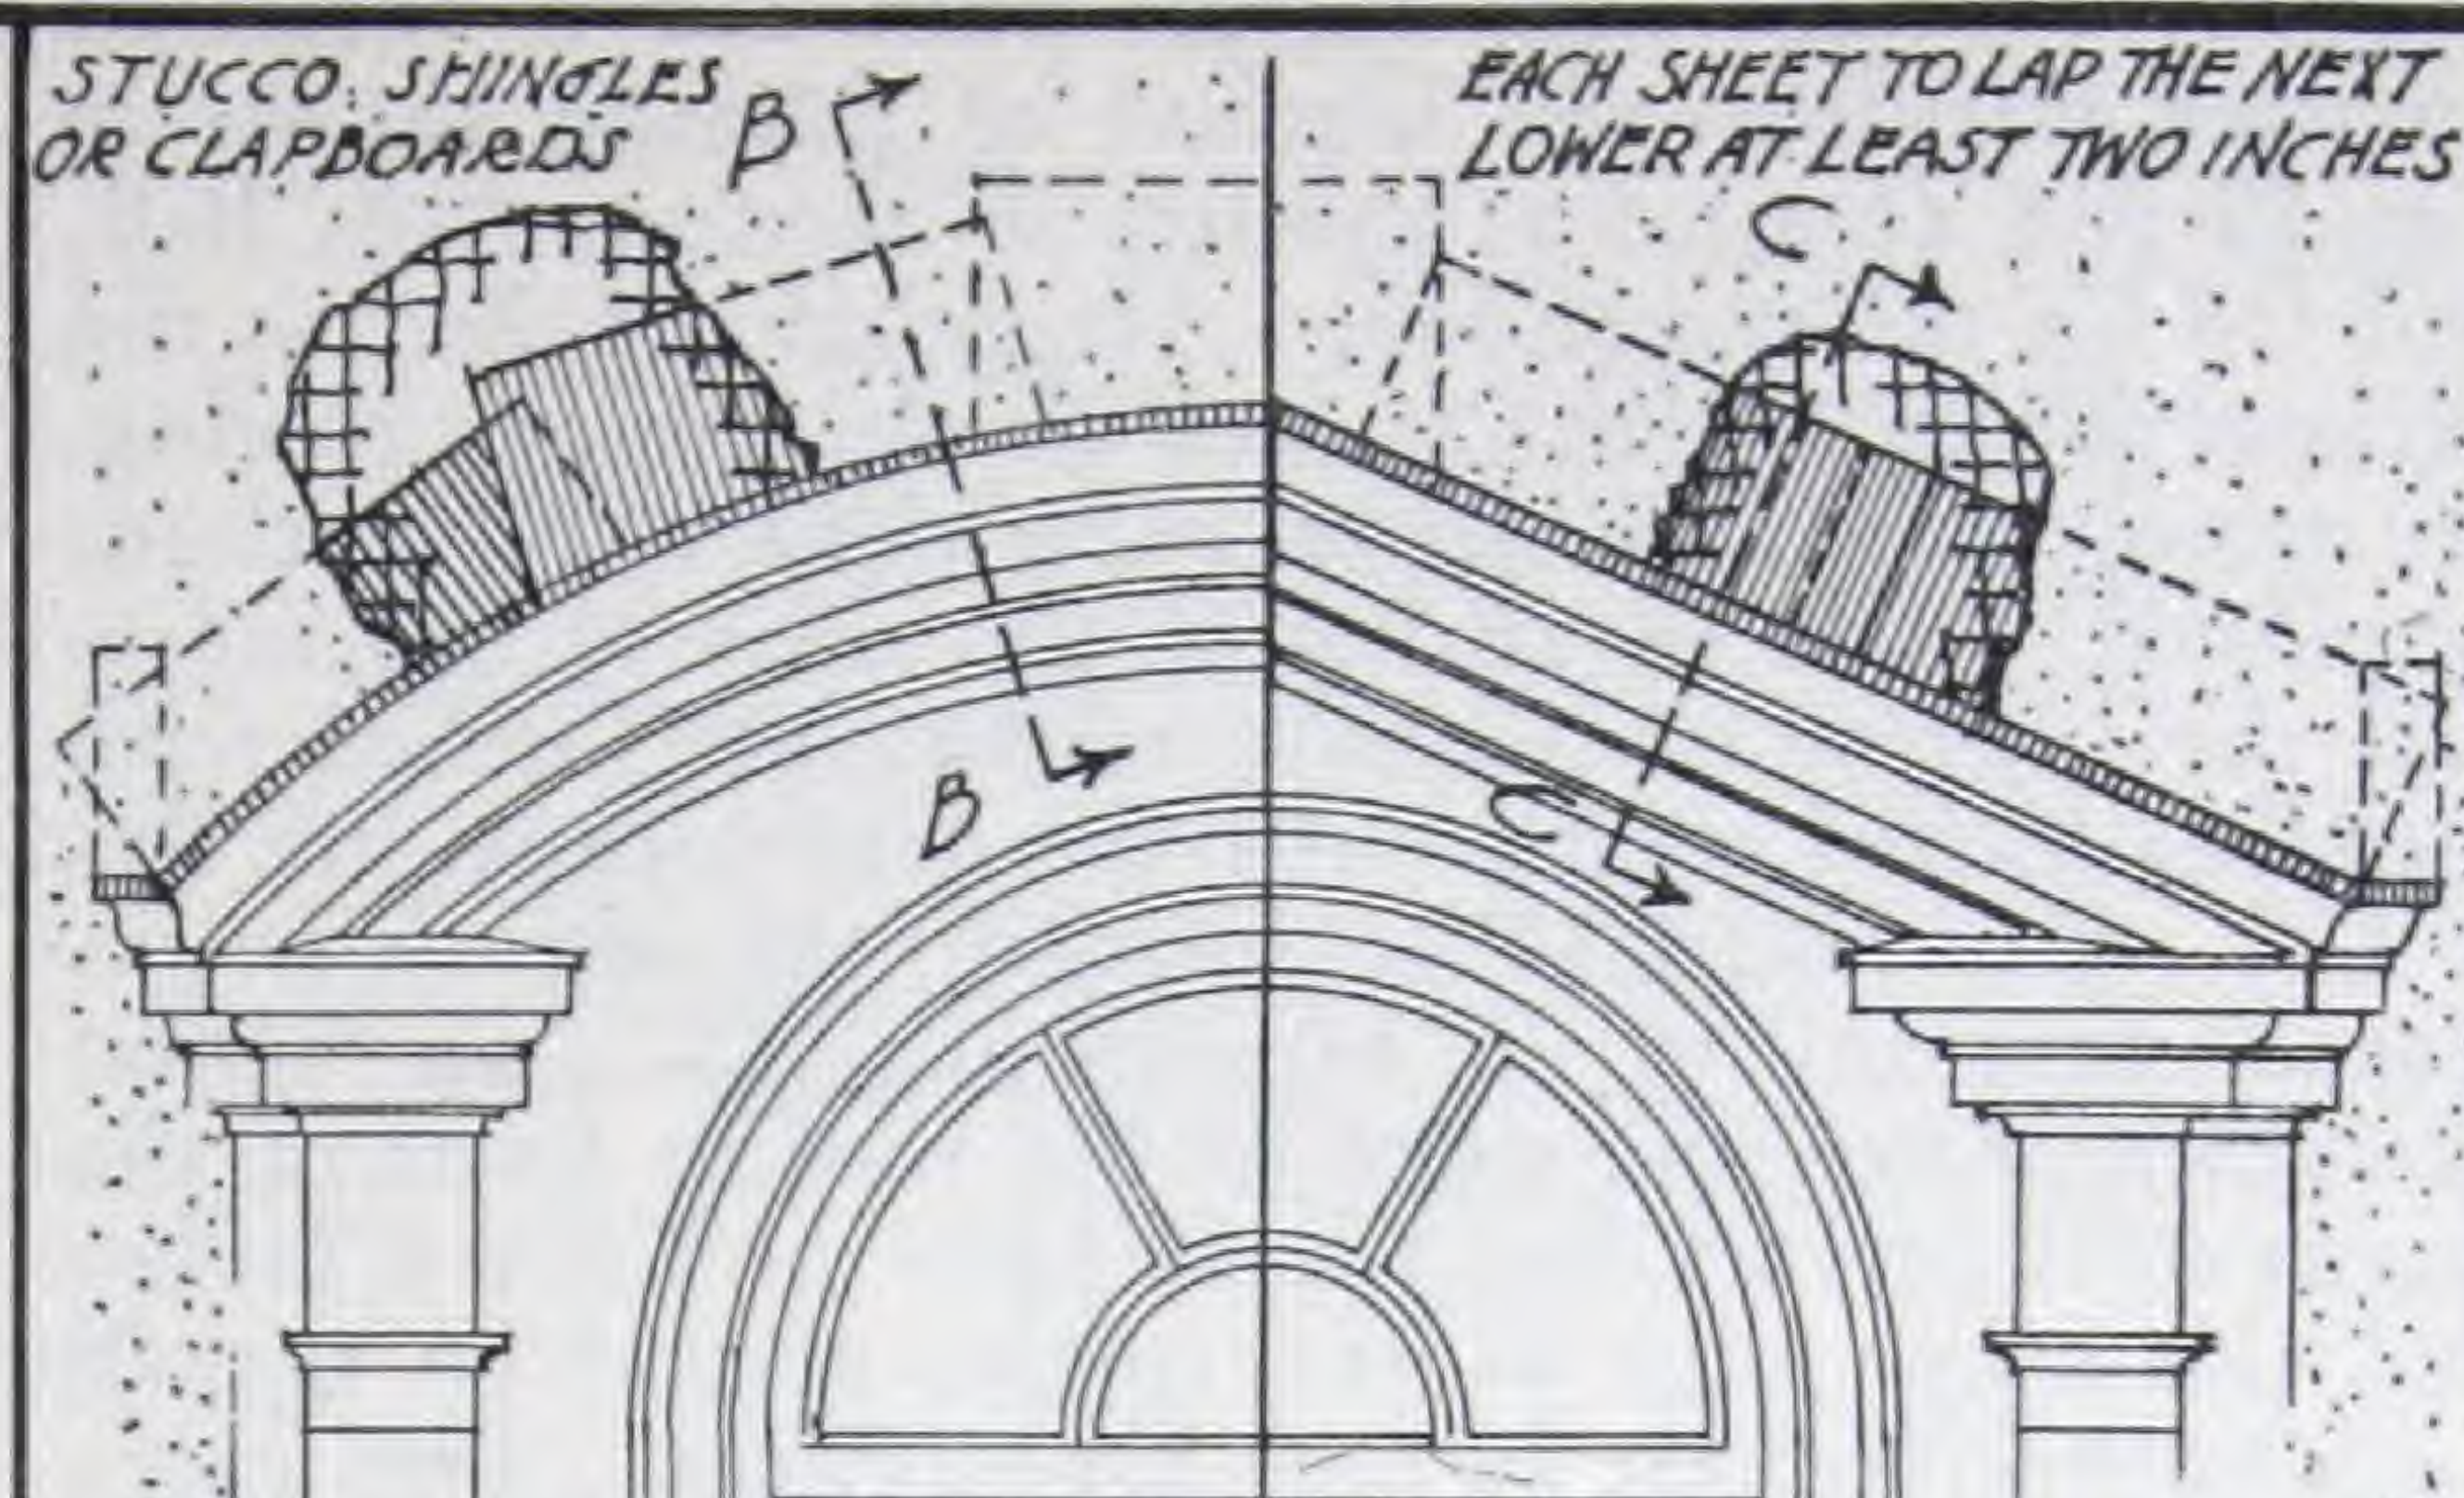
If a wood doorway is set against a wood wall covered with stucco as shown in Fig. 16, the moldings will be in place before the stucco is applied. The flashing may be made in one piece instead of two as shown in Fig. 17 (except when the head is segmental). The flashing is first hooked over a brass edge-strip nailed or screwed to the face of the top molding (described in the text on page 54) and extended up on wall at least 4 inches. The lath is brought down outside and a little in front of the flashing but nailed above it and the stucco then applied. If the flashing is made in several sheets as shown in Fig. 16, each sheet of flashing should lap outside the next lower sheet at least 2 inches. The flashing may be made in one or more long sheets if desired, except where the doorway has a segmental head.
